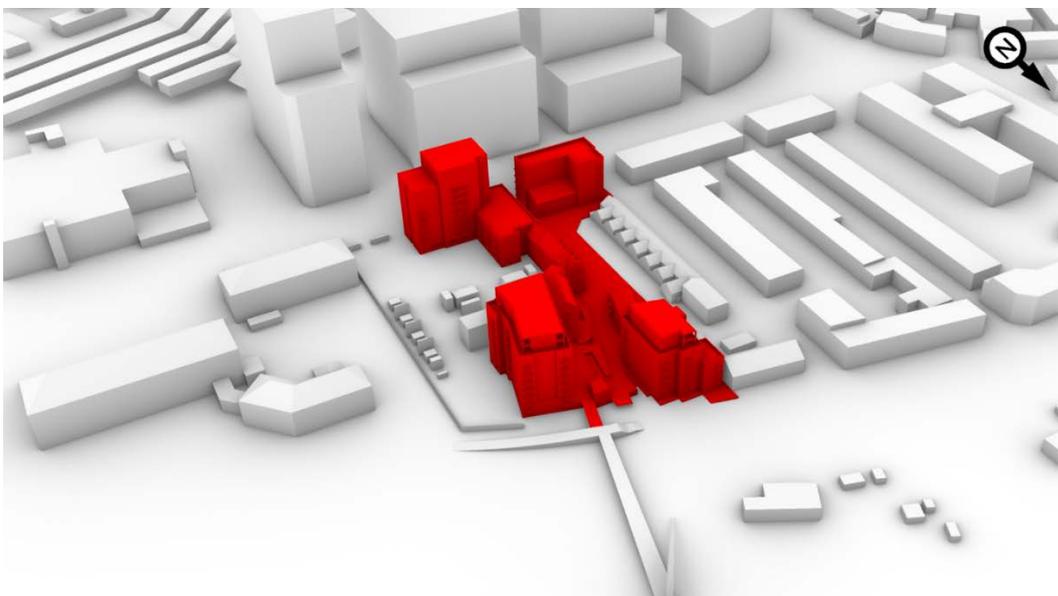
Existing Site with Existing Surrounding Buildings (Configuration 1) - View from the north-east
